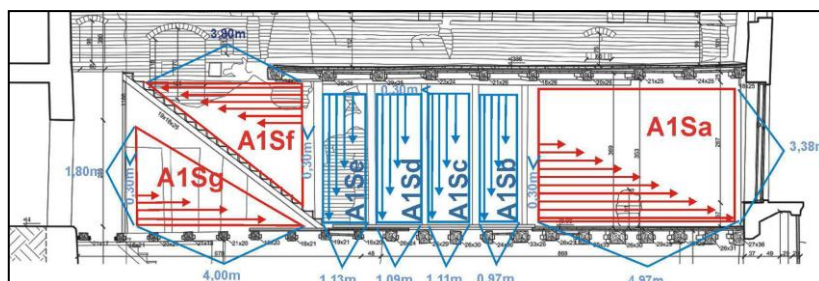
'Section A', longitudinal, ground floor, south wall. Markers indicate areas where GPR survey was conducted; architectural drawing by M.Prarat and U.Schaaf.
